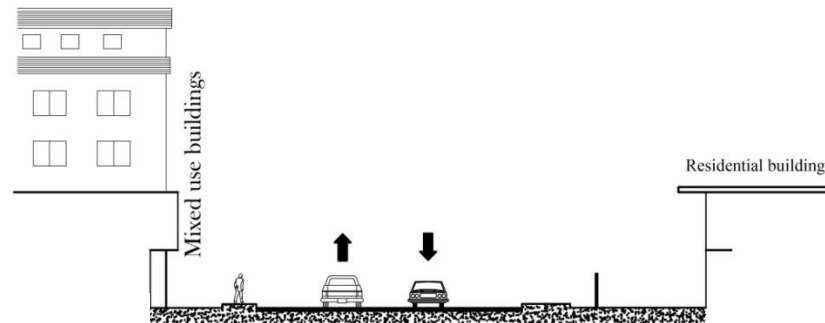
Section B-B of N. Salamis looking south (Drawn by author)
